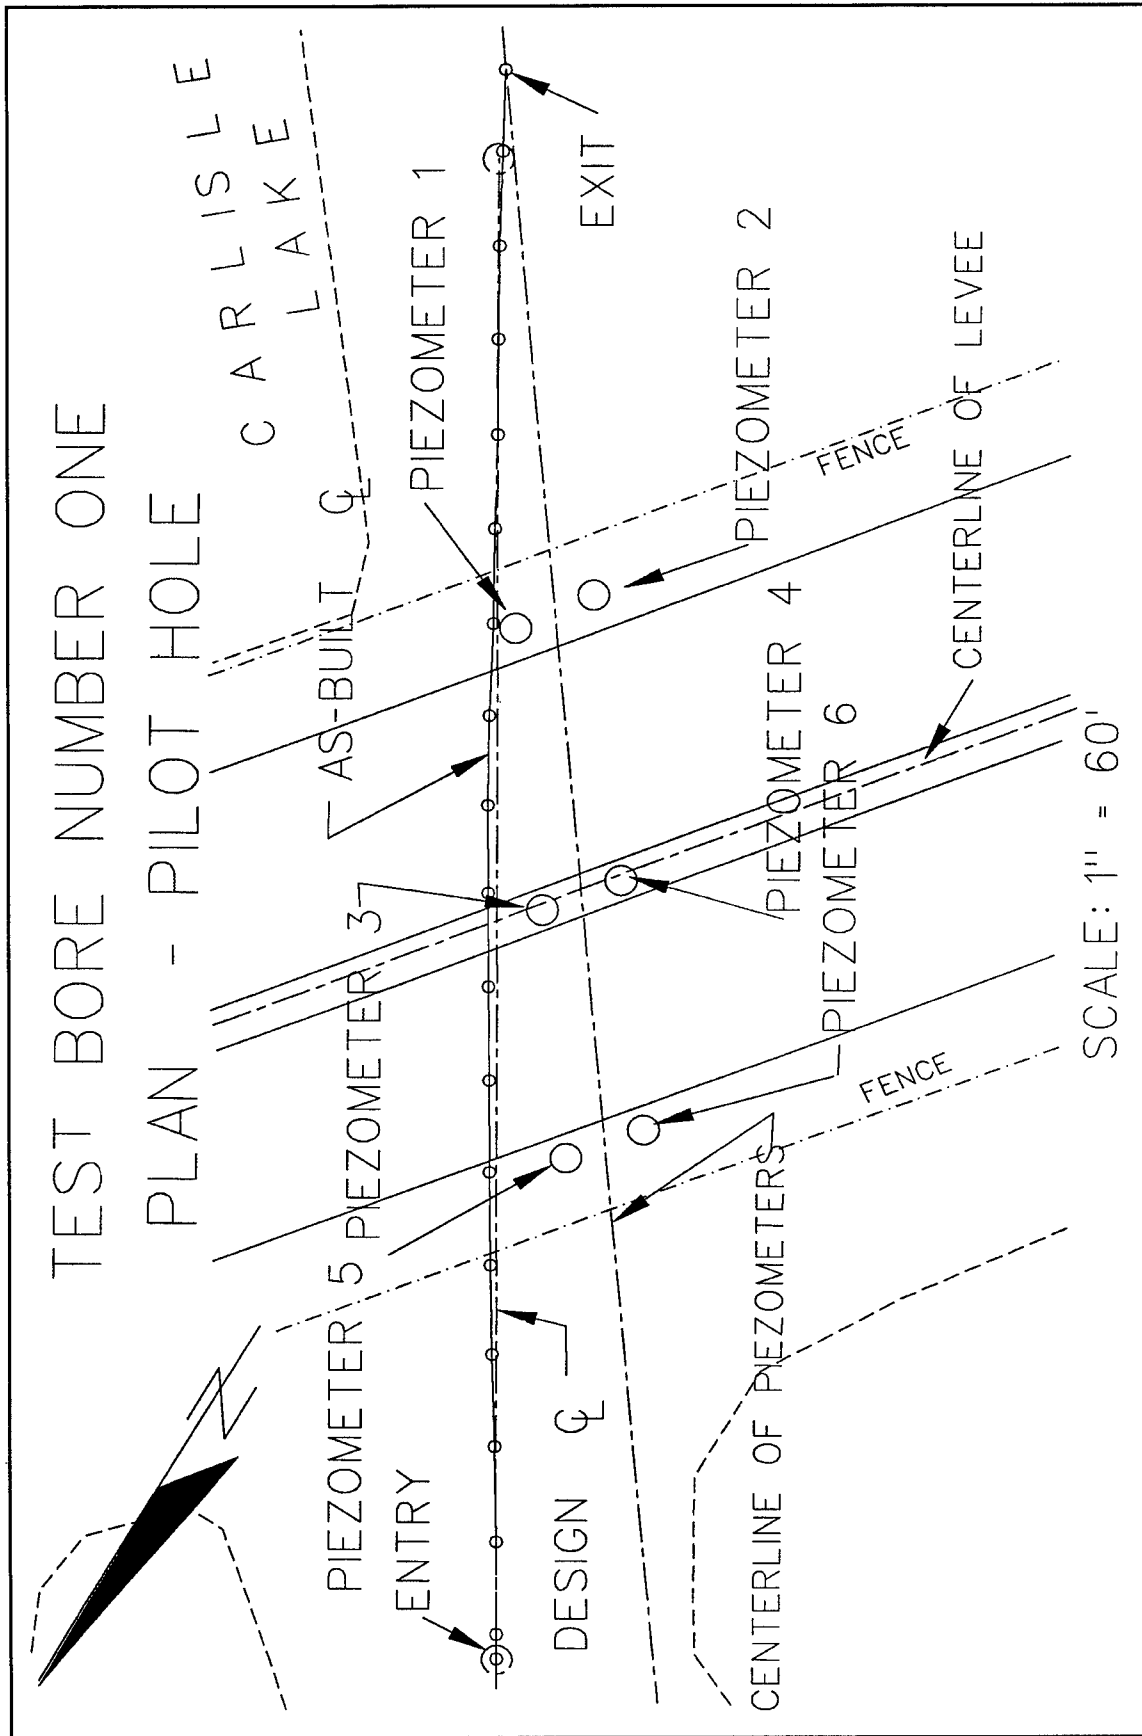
Plan view of Bore 1; planned and as-built location. (To convert inches to centimeters, multiply by 2.54; to convert feet to meters, multiply by 0.305)
